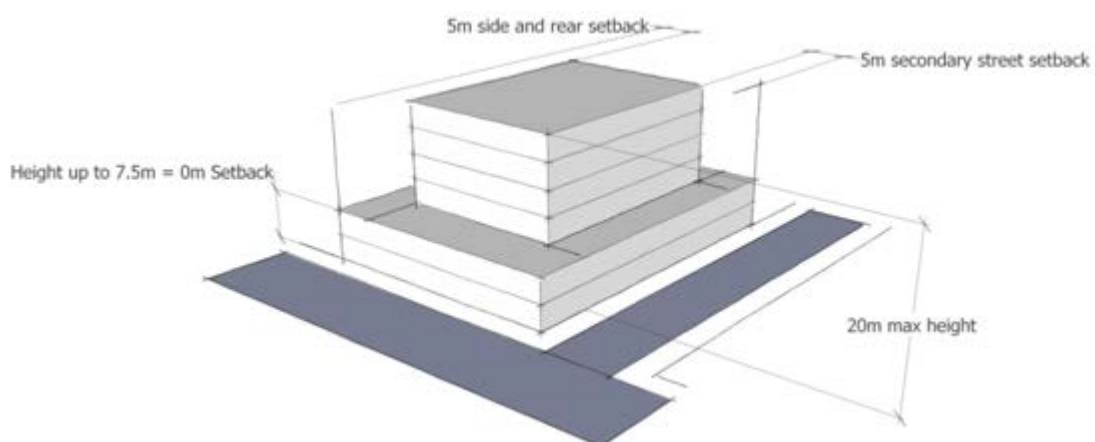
a – Height, setbacks and site cover for buildings in Precinct 1 – Edmonton Centre Core
